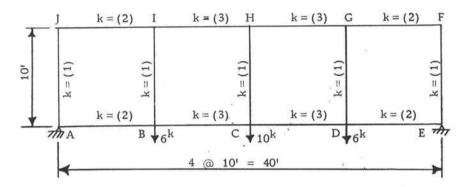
2. 1. Symmetrically loaded Vierendeel Truss
